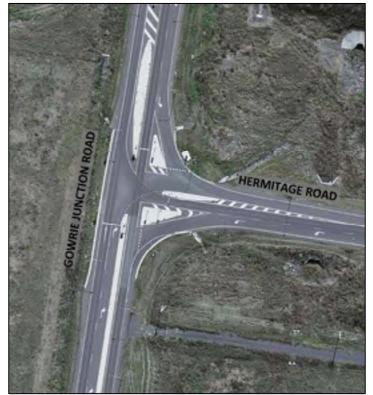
Gowrie Junction Road/Hermitage Road intersection
